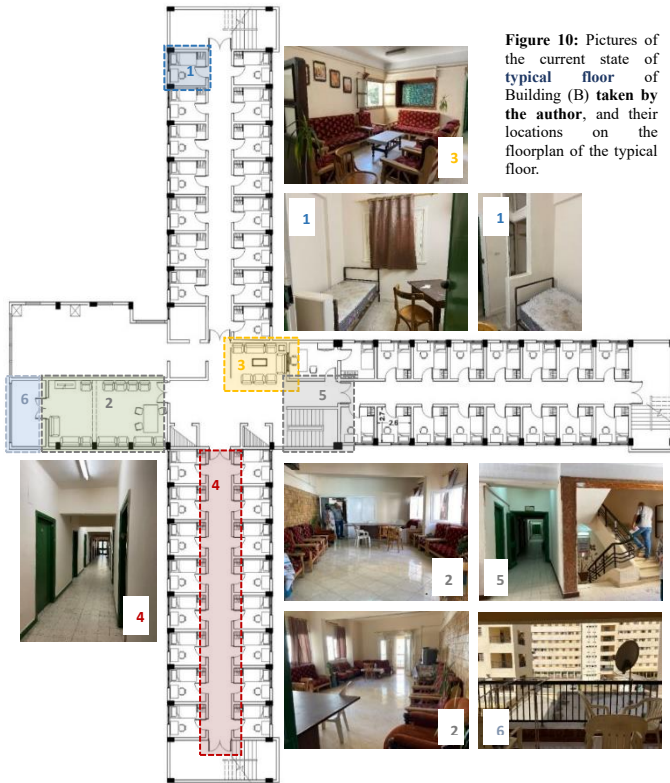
Pictures of the current state of typical floor of Building (B) taken by the author, and their locations on the floorplan of the typical floor.
